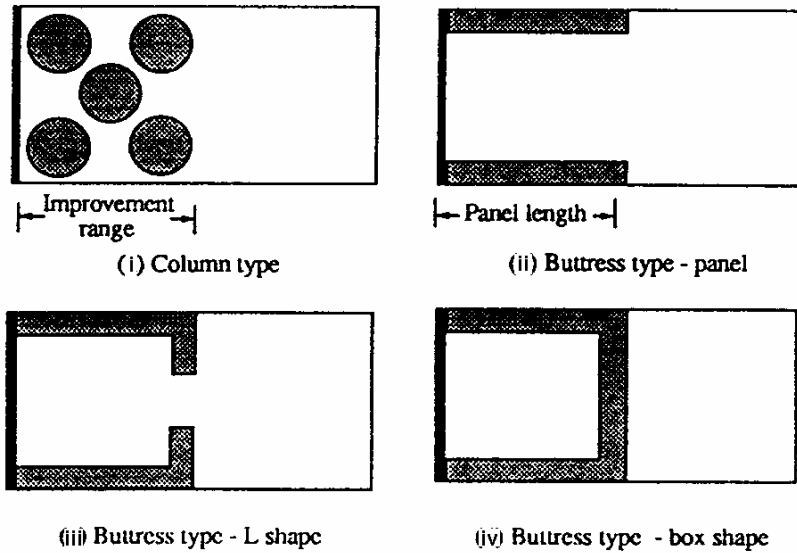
(a) Layout patterns for reinforced soil specimens [after Liao and Tsai (1993)]
